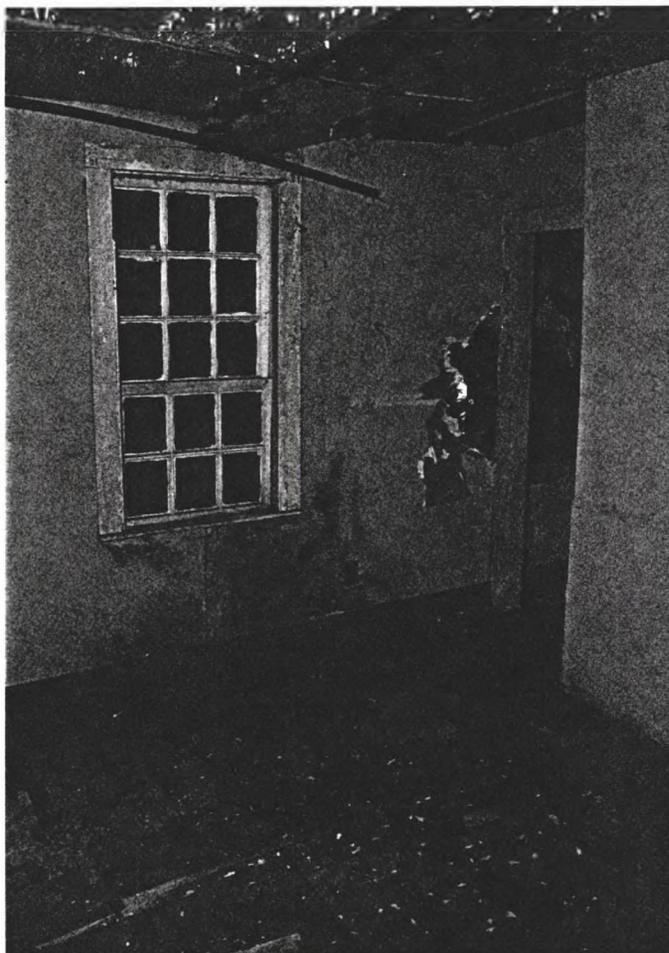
Rotting floors and damaged surface materials in Room 1-5 of frame addition.
